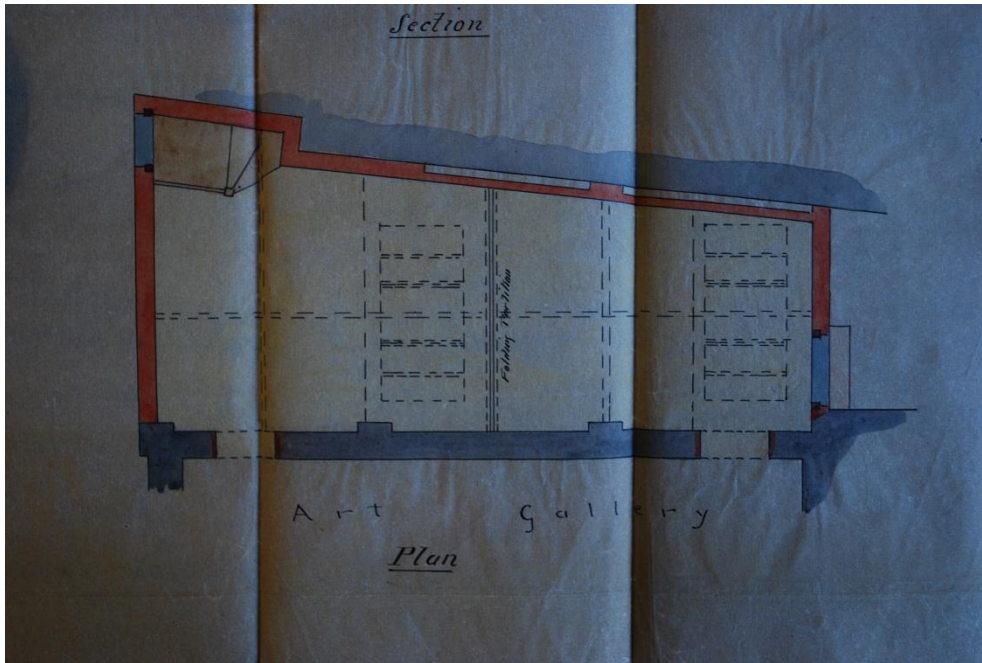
1893. Detail from plans to extend the Art Gallery (Suffolk Record Office, drainage plan no. 3037).
